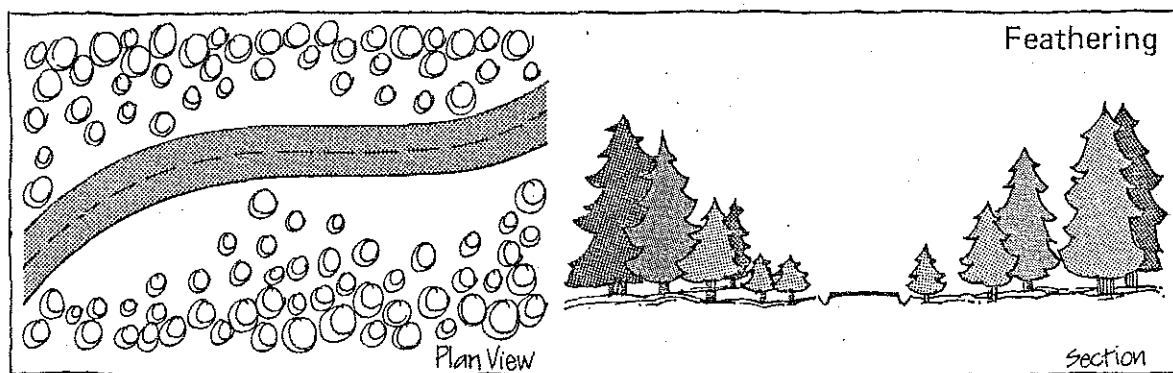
FEATHERING - PLAN AND SECTION VIEW
